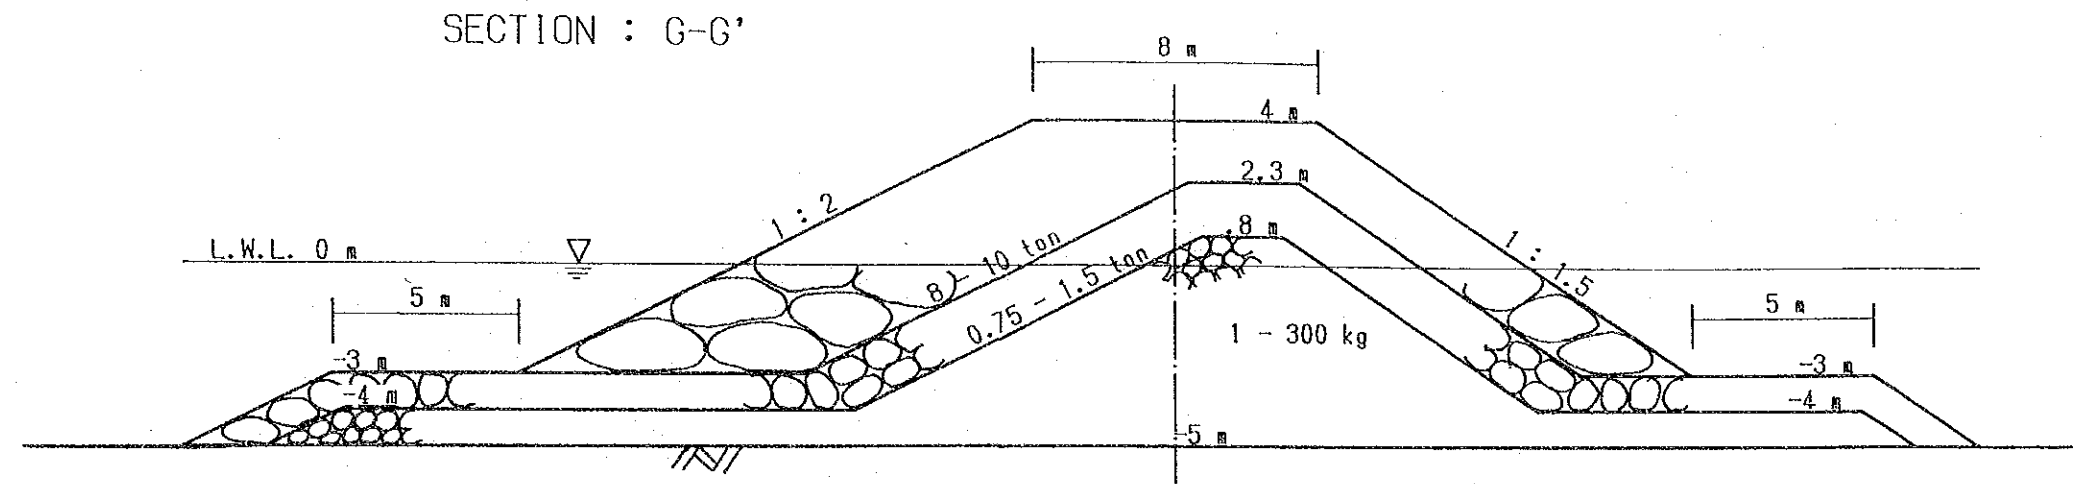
(3) Typical Cross Sections [Groyne]
